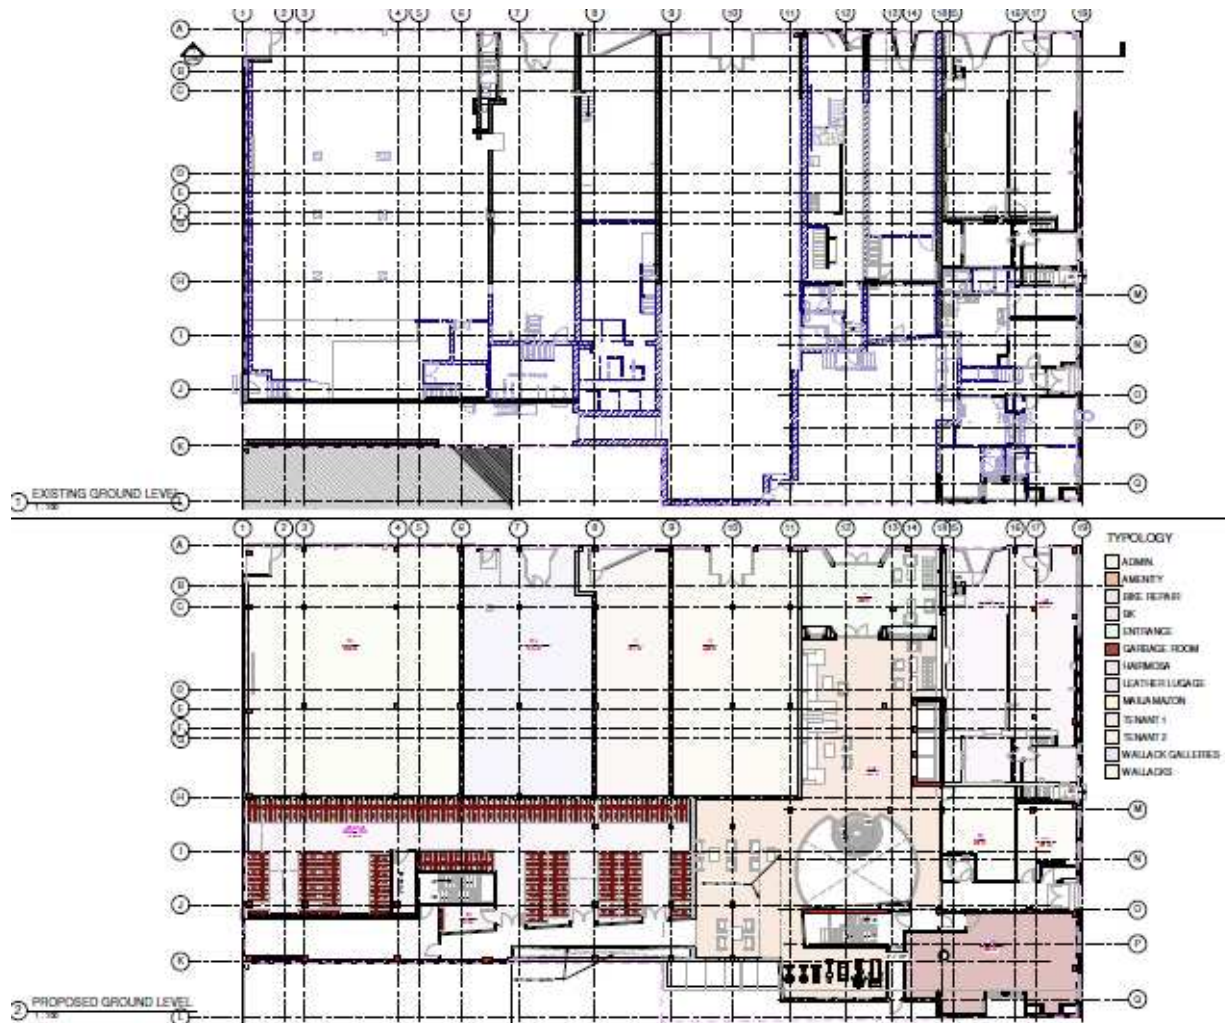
Ground floor plan of the existing with the proposed development illustrating the retention of the shopfronts of the four properties on Bank Street. Source: Woodman Architecture 2022.
